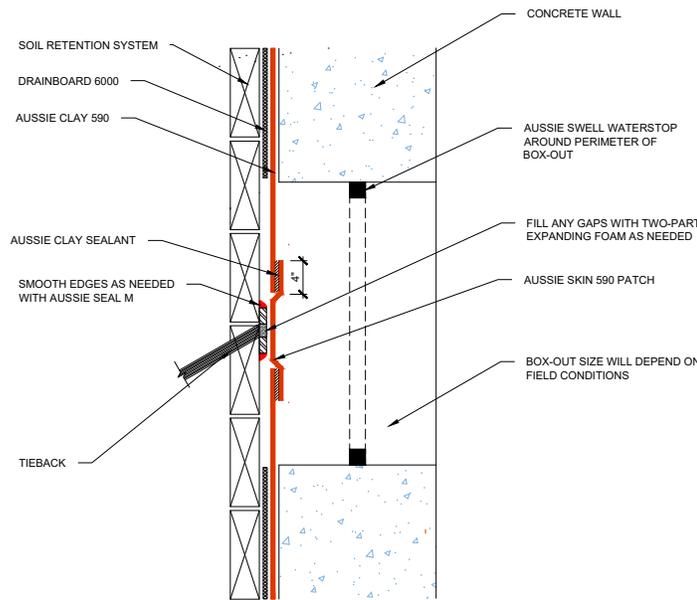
4" TIE-BACK/SOIL ANCHOR DETAIL
